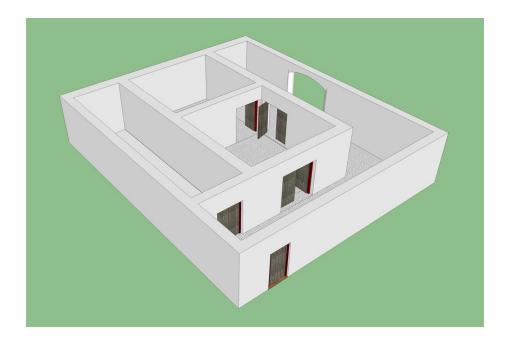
East Farleigh building five internal showing arrangement of doors, (Clifton, 2020)
